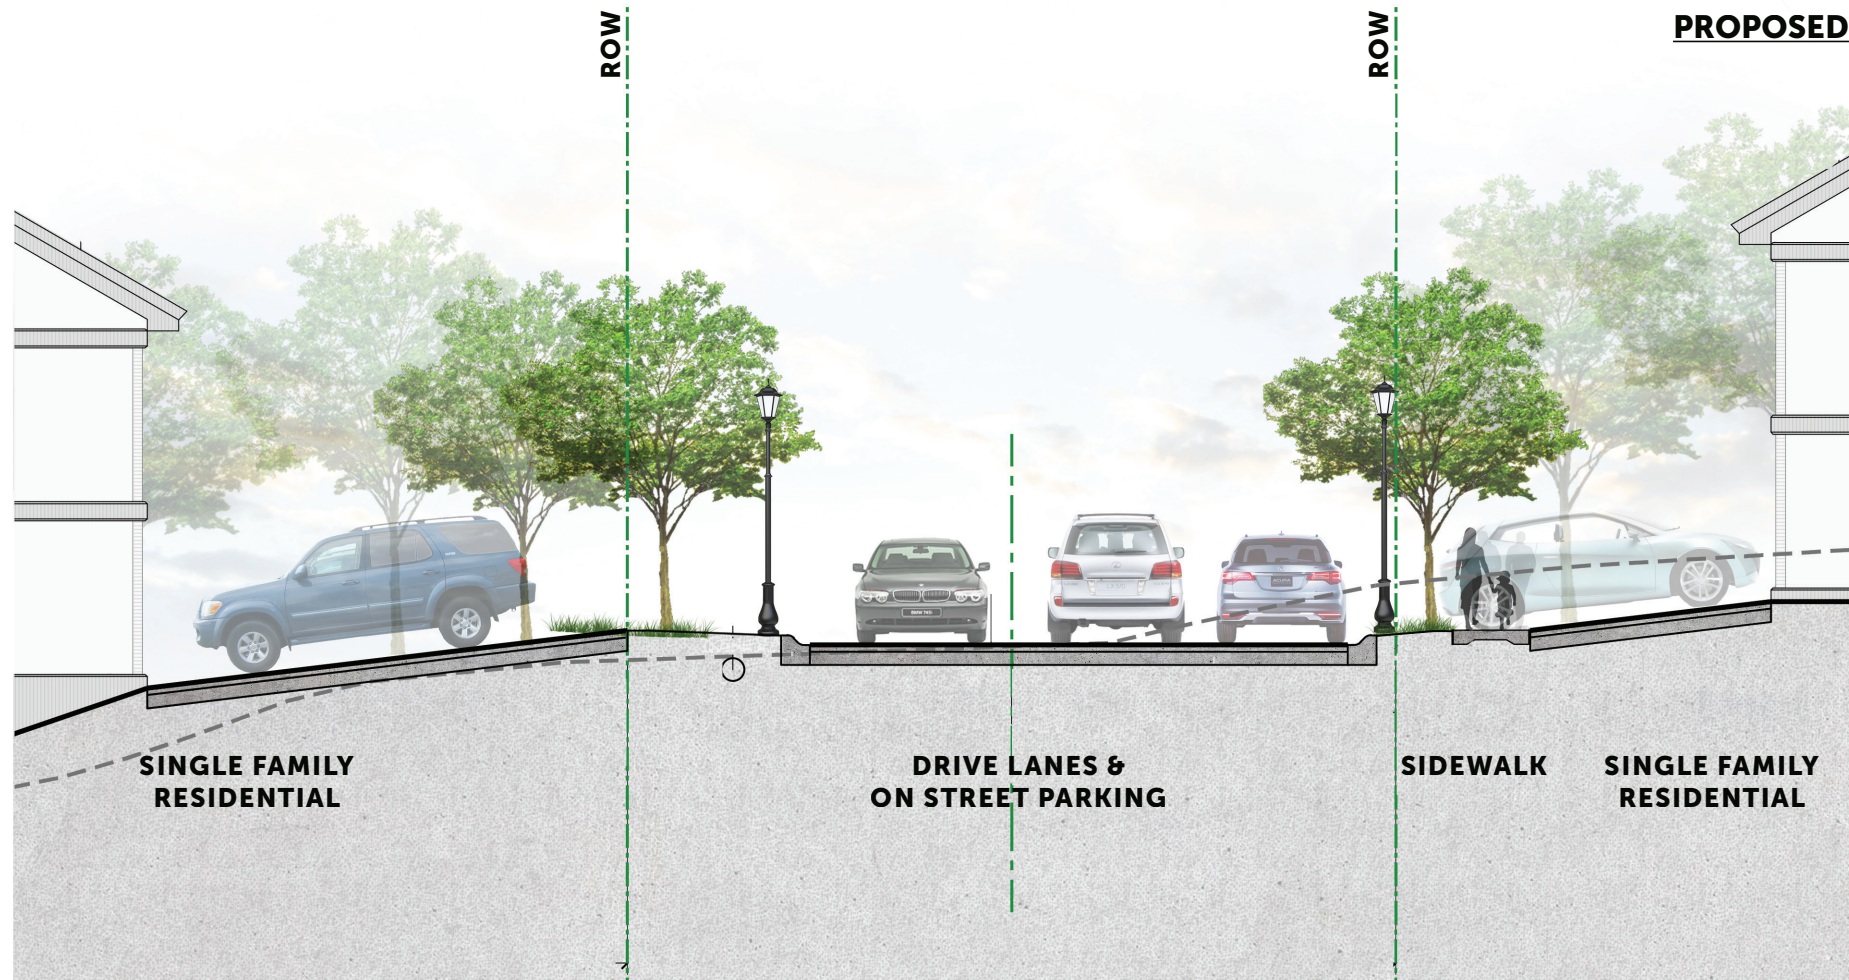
Bunker Hill Boulevard Proposed Development Typical Street
